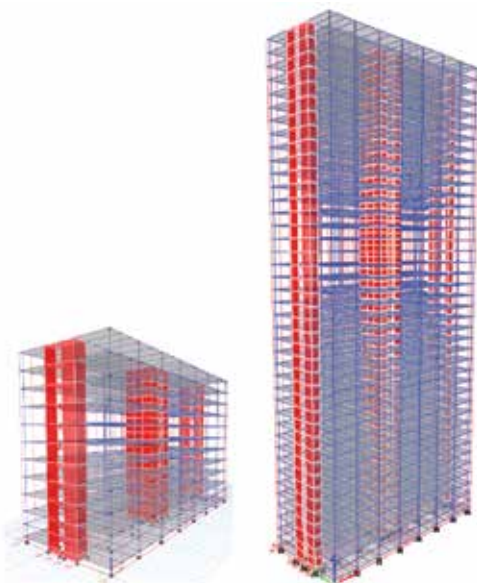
10-Storey & 40-Storey 3D-Elevations
